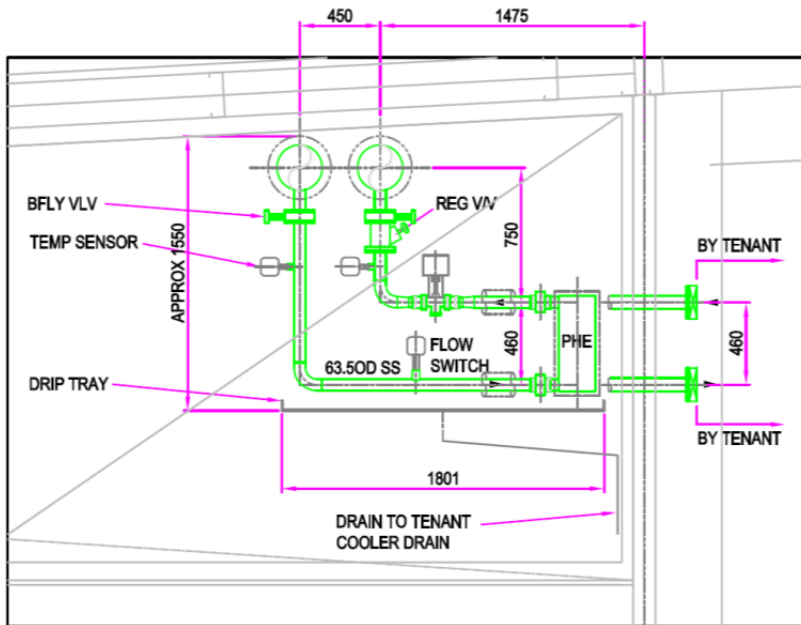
Tenant Plate Heat Exchanger Arrangement - Detail (not to scale)
